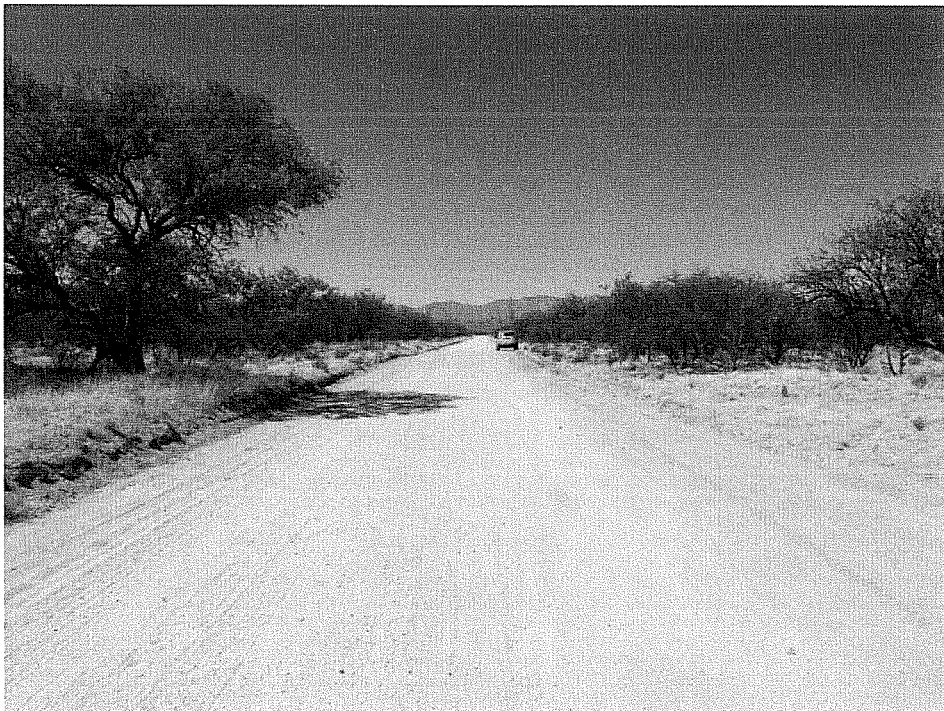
VIEW NORTHEAST ALONG ELKHORN RANCH ROAD
